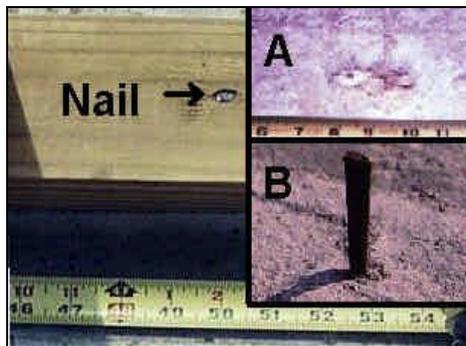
Cut nail in the perimeter bottom plate was a violation of the local building code. Inset photograph A shows scrape mark in the slab after wall slid off foundation. Inset photograph B is a cut nail left in the foundation after home was blown away.
